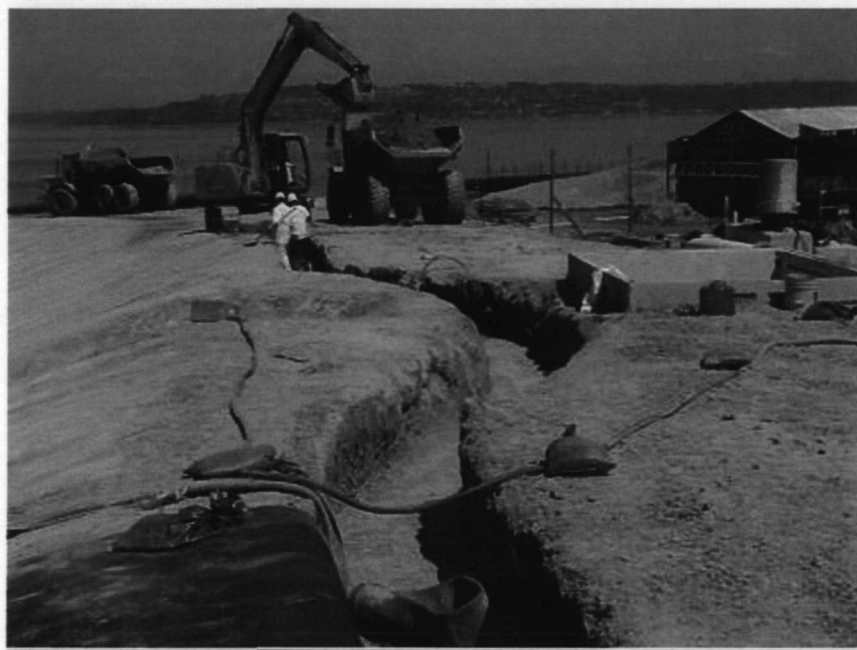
excavation of anchor trench for bottom liner near Vault #1.
